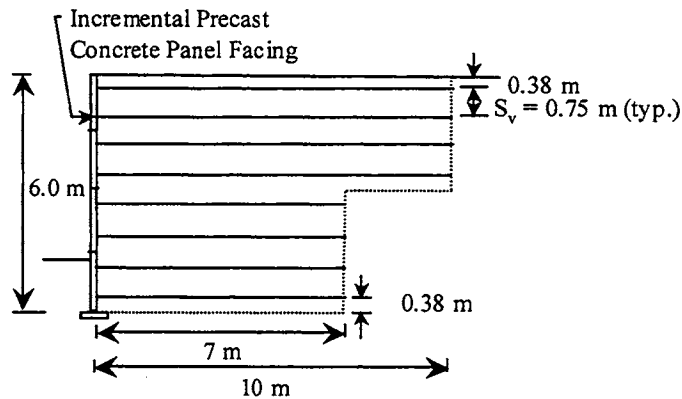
Lille, France, steel strip test wall (adapted from Bastick, 1984).
